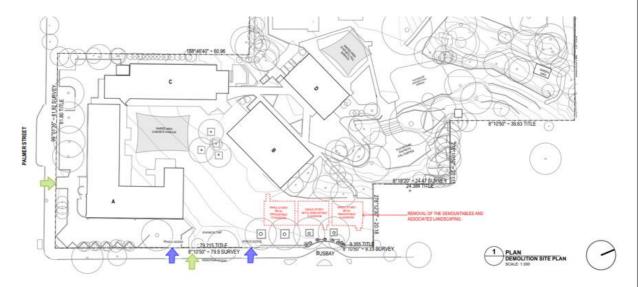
Demolition plan – south-eastern section of site (Source: Fulton Trotter Architects)
